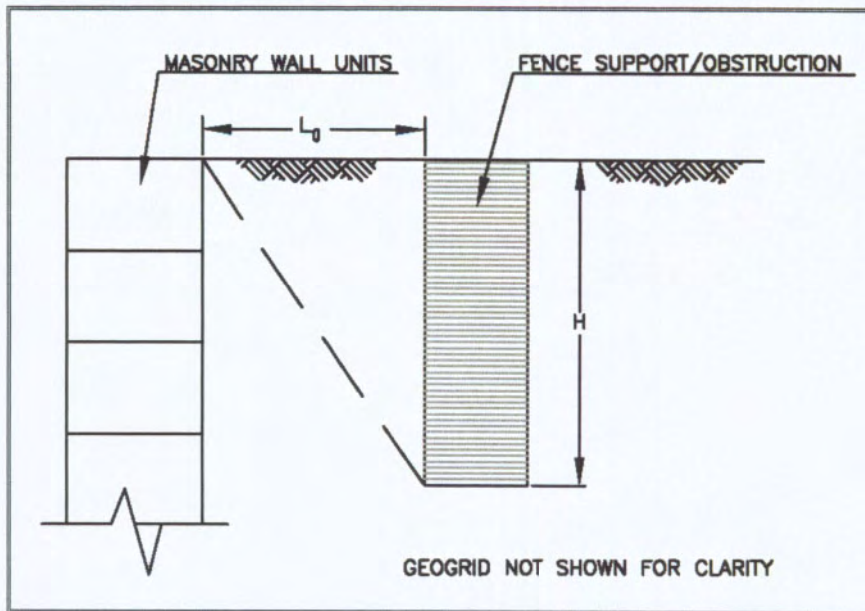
Minimum offset for fence support to act independently from the retaining wall.
